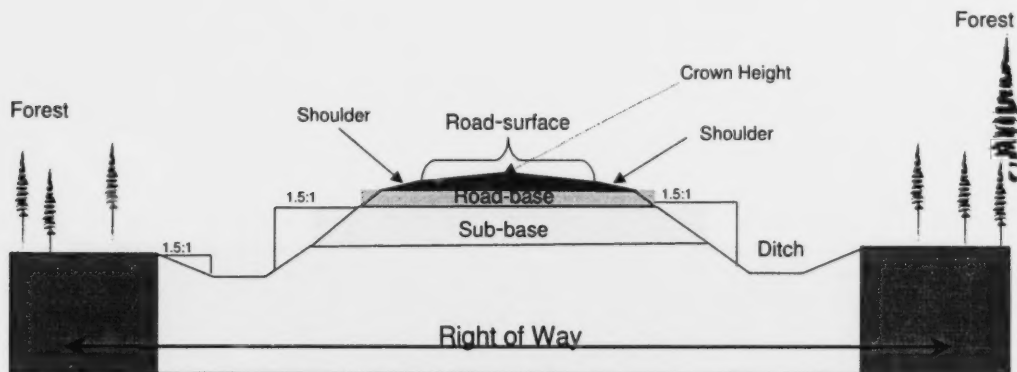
Typical road cross-section (Adapted from: FERIC, 1999)
